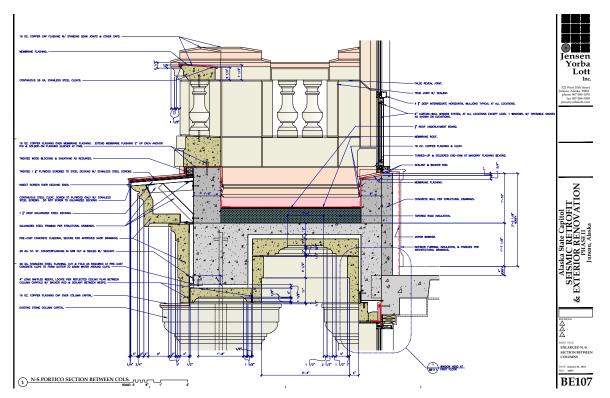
Retrofit Design Drawing, Portico, 2015
